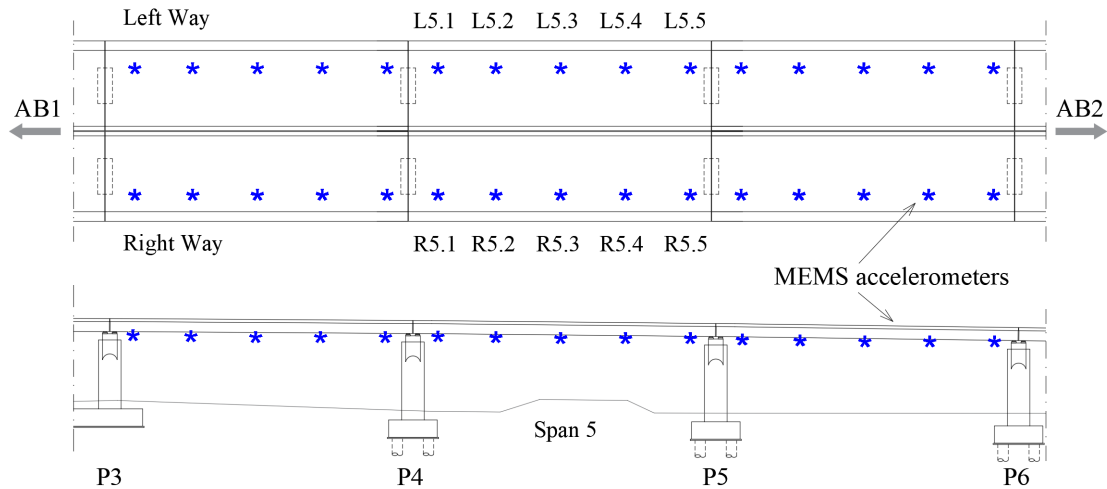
Sensors positioning on the bridge - Plan and elevation view
